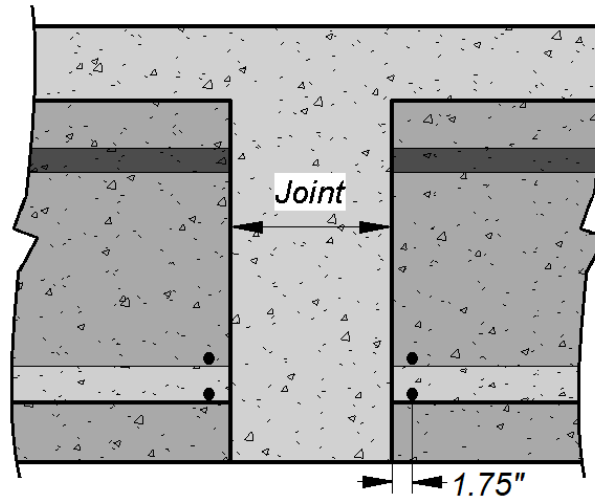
Horizontal location of drilled holes for anchoring repair reinforcement
